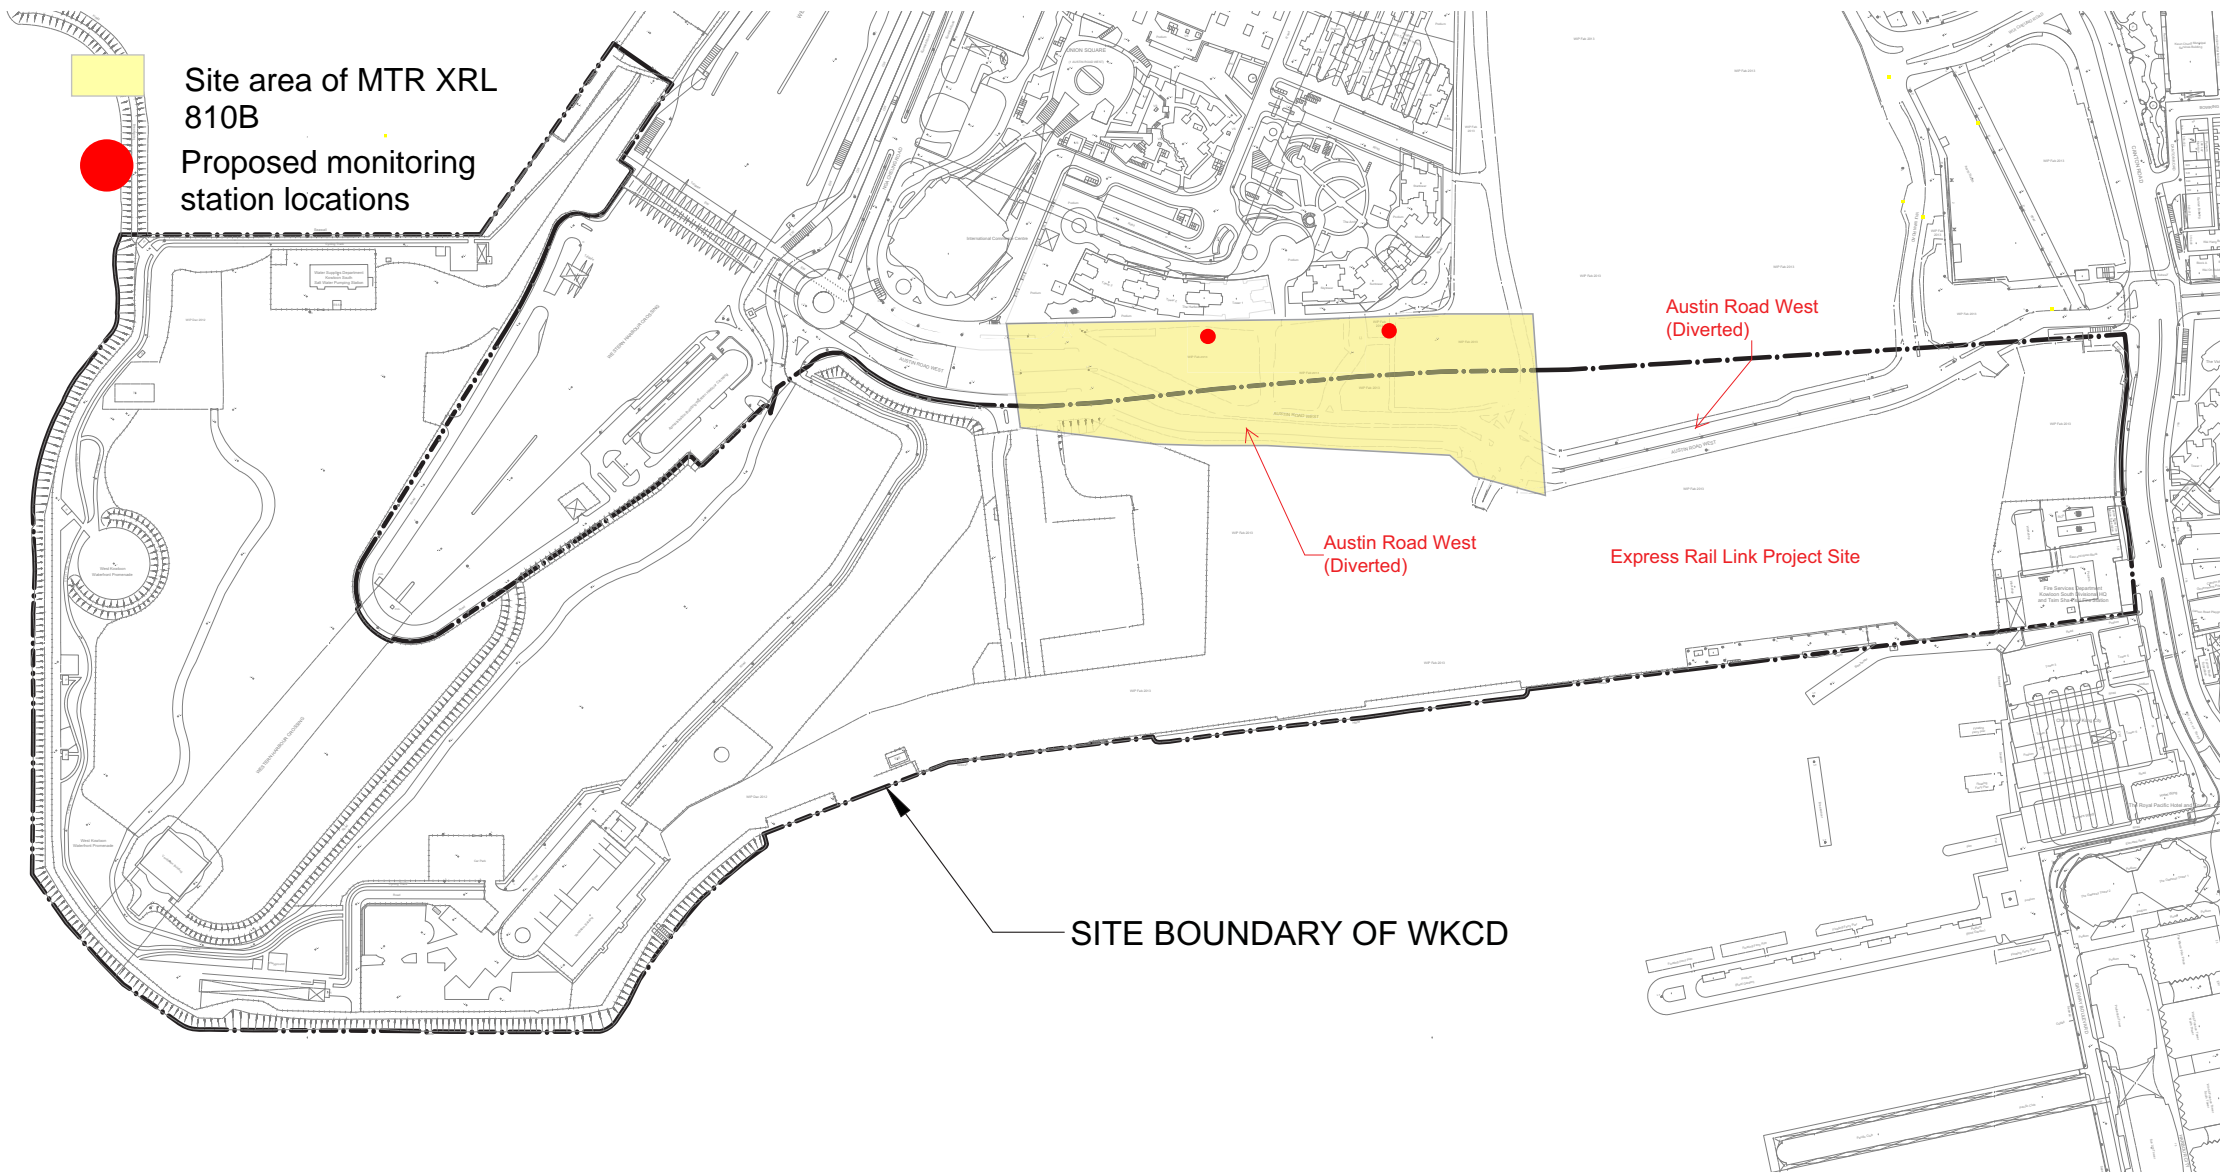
Proposed noise monitoring station location at MTR XRL 810B Construction Site
